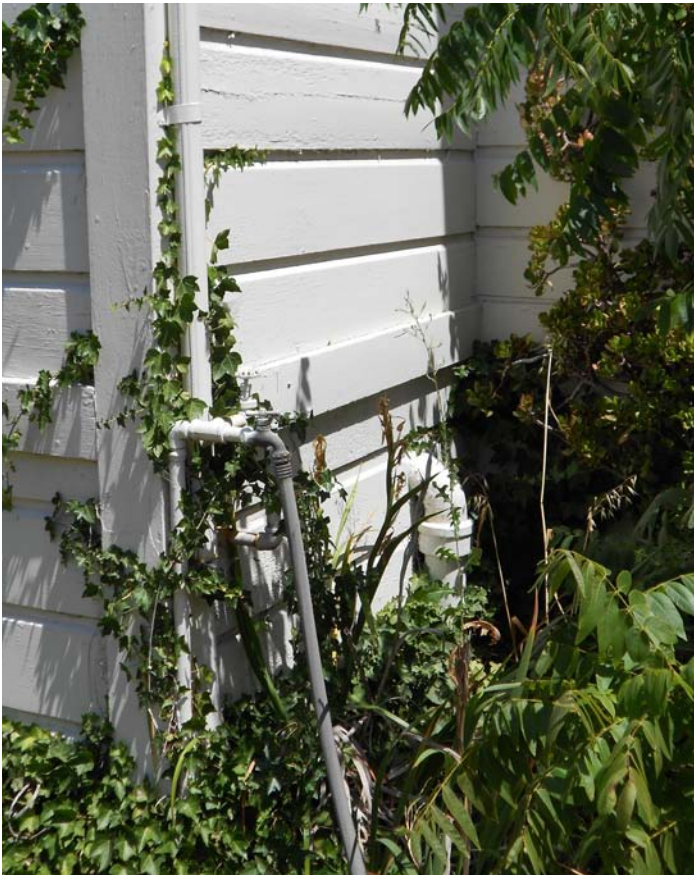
Overgrown vegetation at southwest corner of bathroom wing, west elevation. (July, 2014) (S&S)
